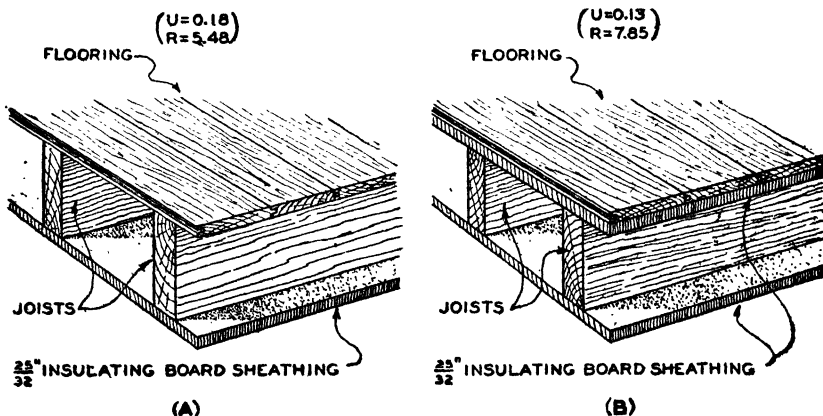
Insulating Board Applied to Flat Ceilings: (A) One Layer on Under Side of Joists; (B) Two Layers, One on Under Side of Joists and the Other on Top of Joists, Covered with Flooring
